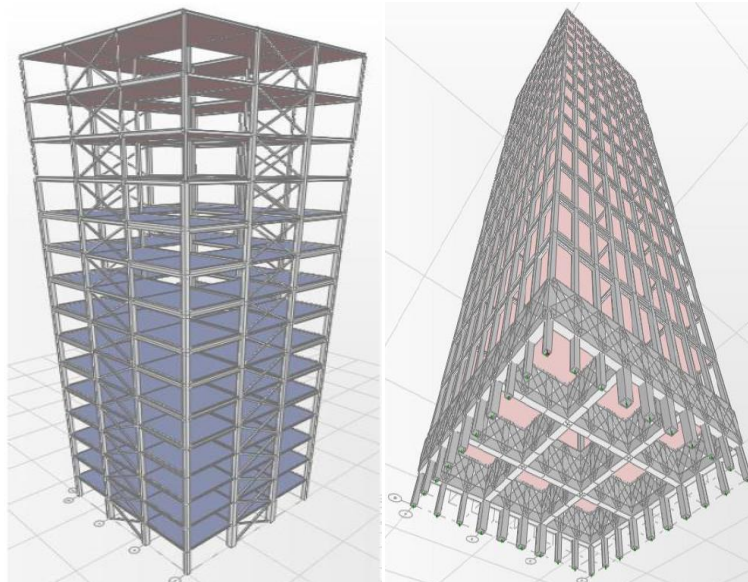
Views of the sample 15-story ordinary building with X-bracing (left) and the rocking building with tubular system and the grid of orthogonal strong girders at its 1st story (right)
